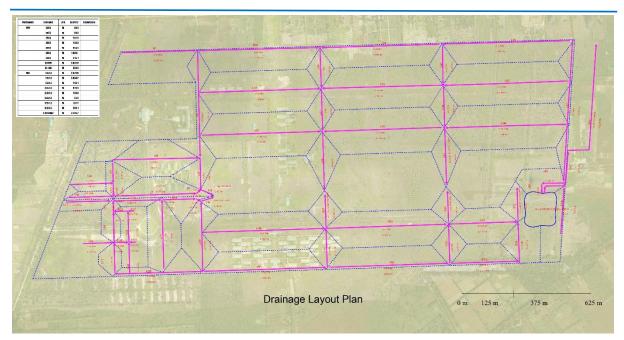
27: Drainage Layout Plan (See clear figure in Appendix)
